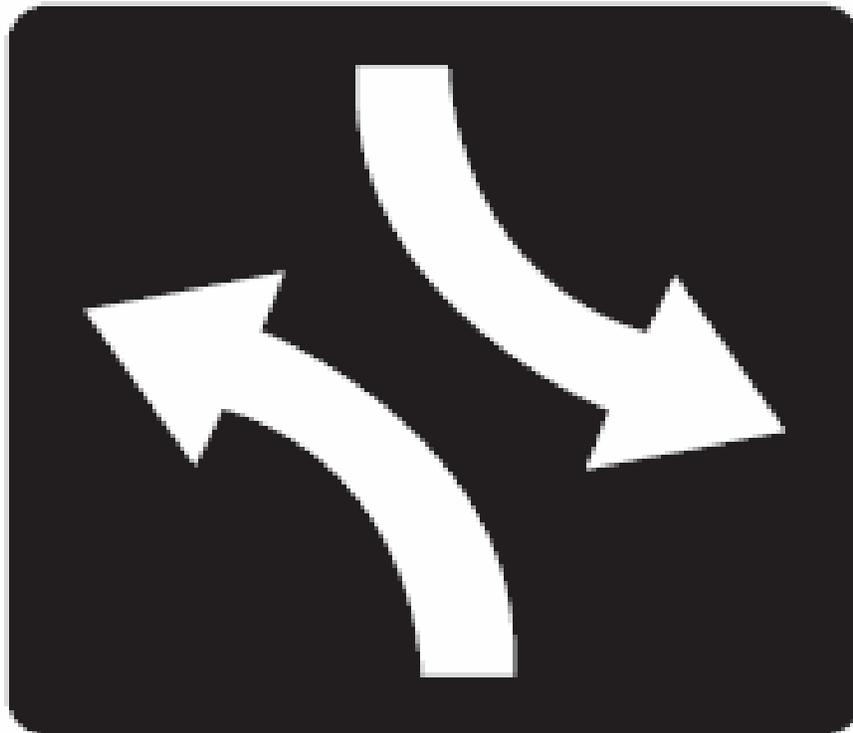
Pavement Arrows for Two-Way Left-Turn Lane (30)
